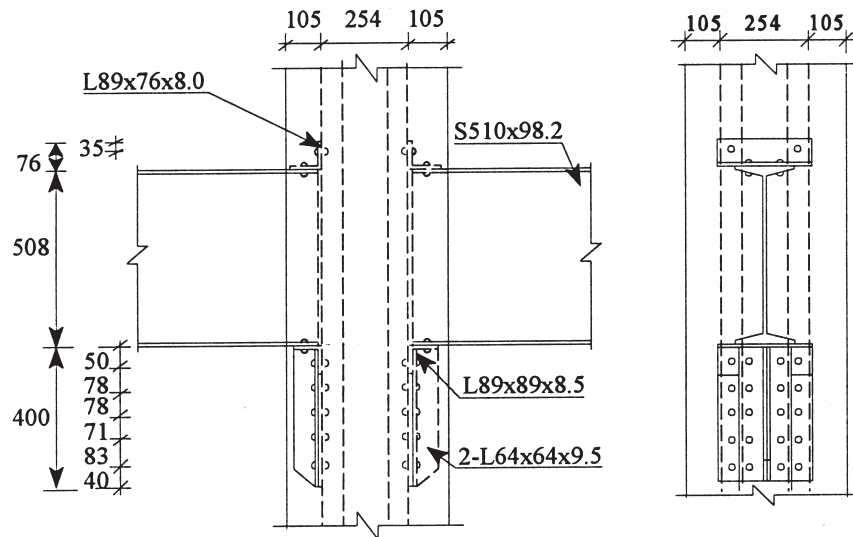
Riveted stiffened seat angle beam-to-column connection detail.
